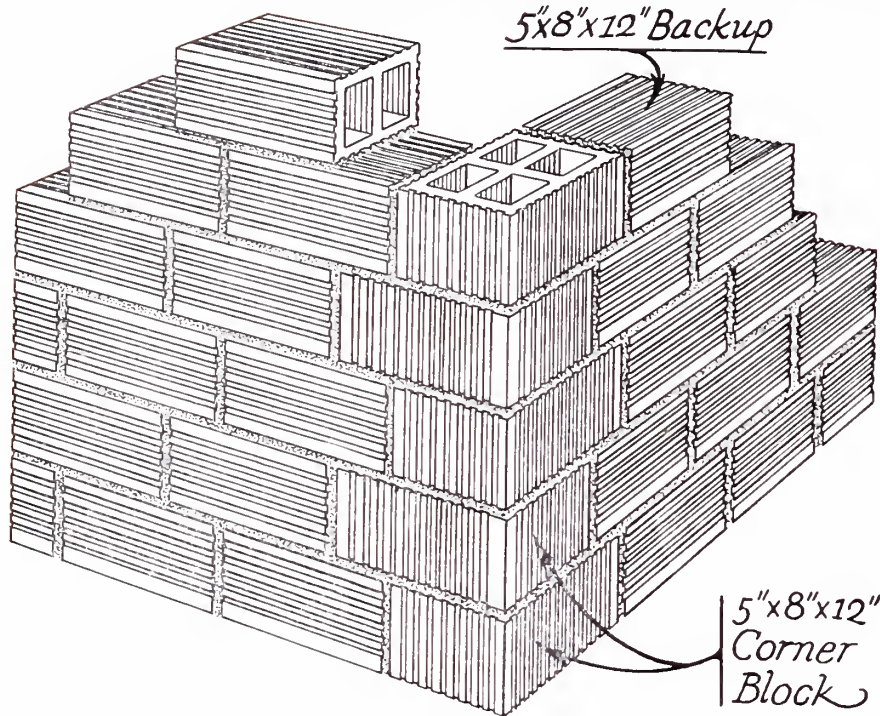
Section of eight-inch load bearing wall constructed of standard 5"x8"x12" backup tile with 5"x8"x12" End Blocks, providing an 8"-4" break in joints.
